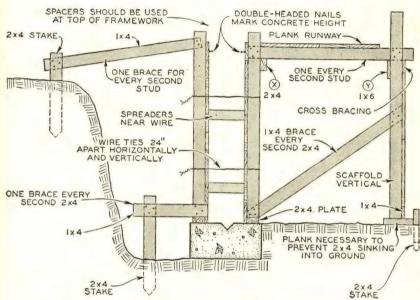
Section of Typical Formwork with Runway for Wheelbarrows
